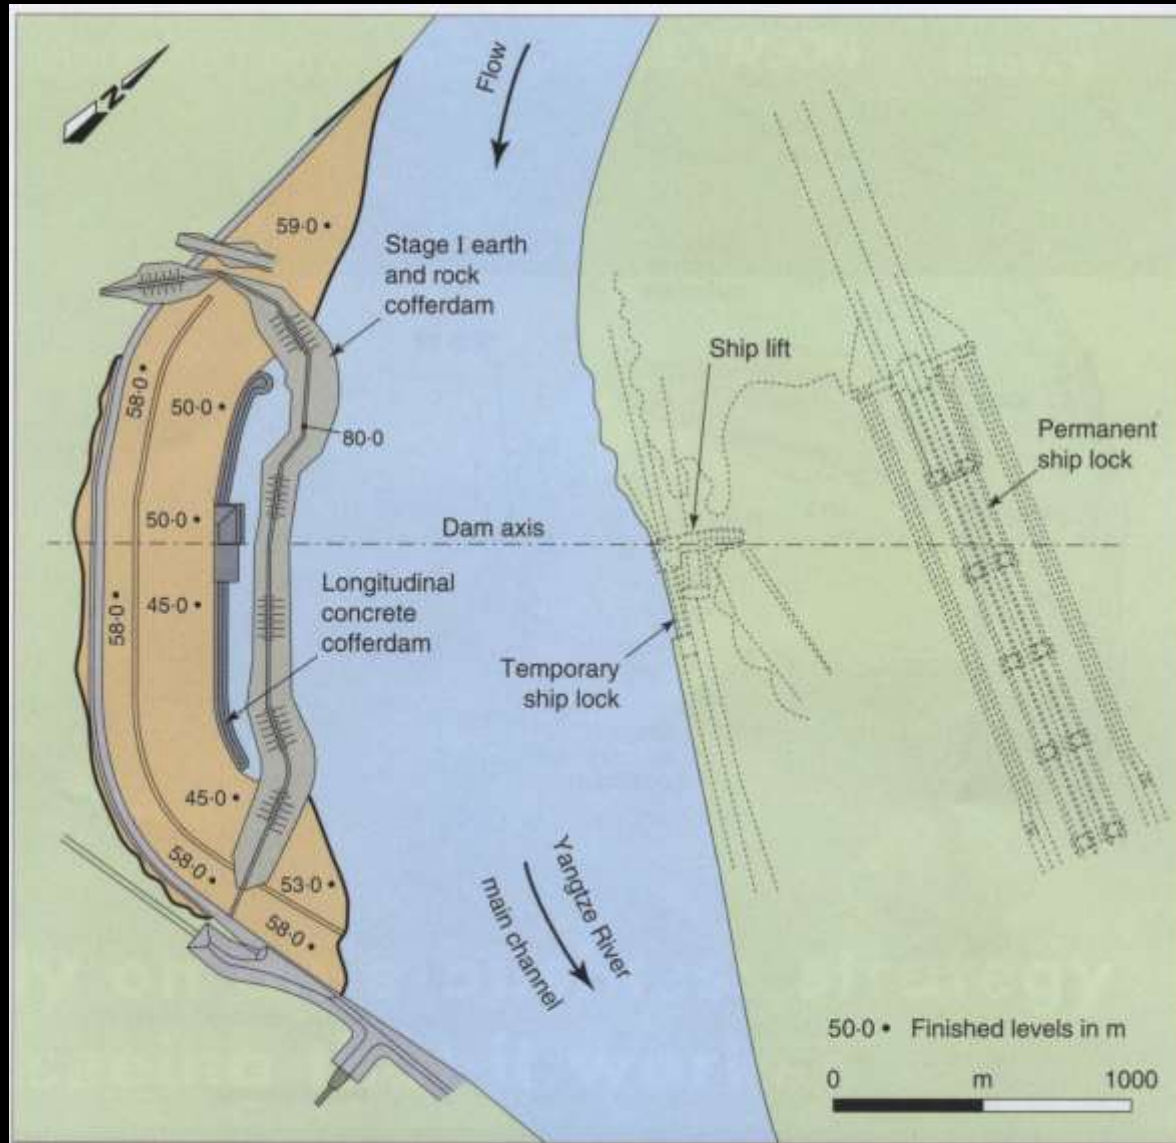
Plan of first-stage cofferdam, which allowed construction of the river diversion channel
